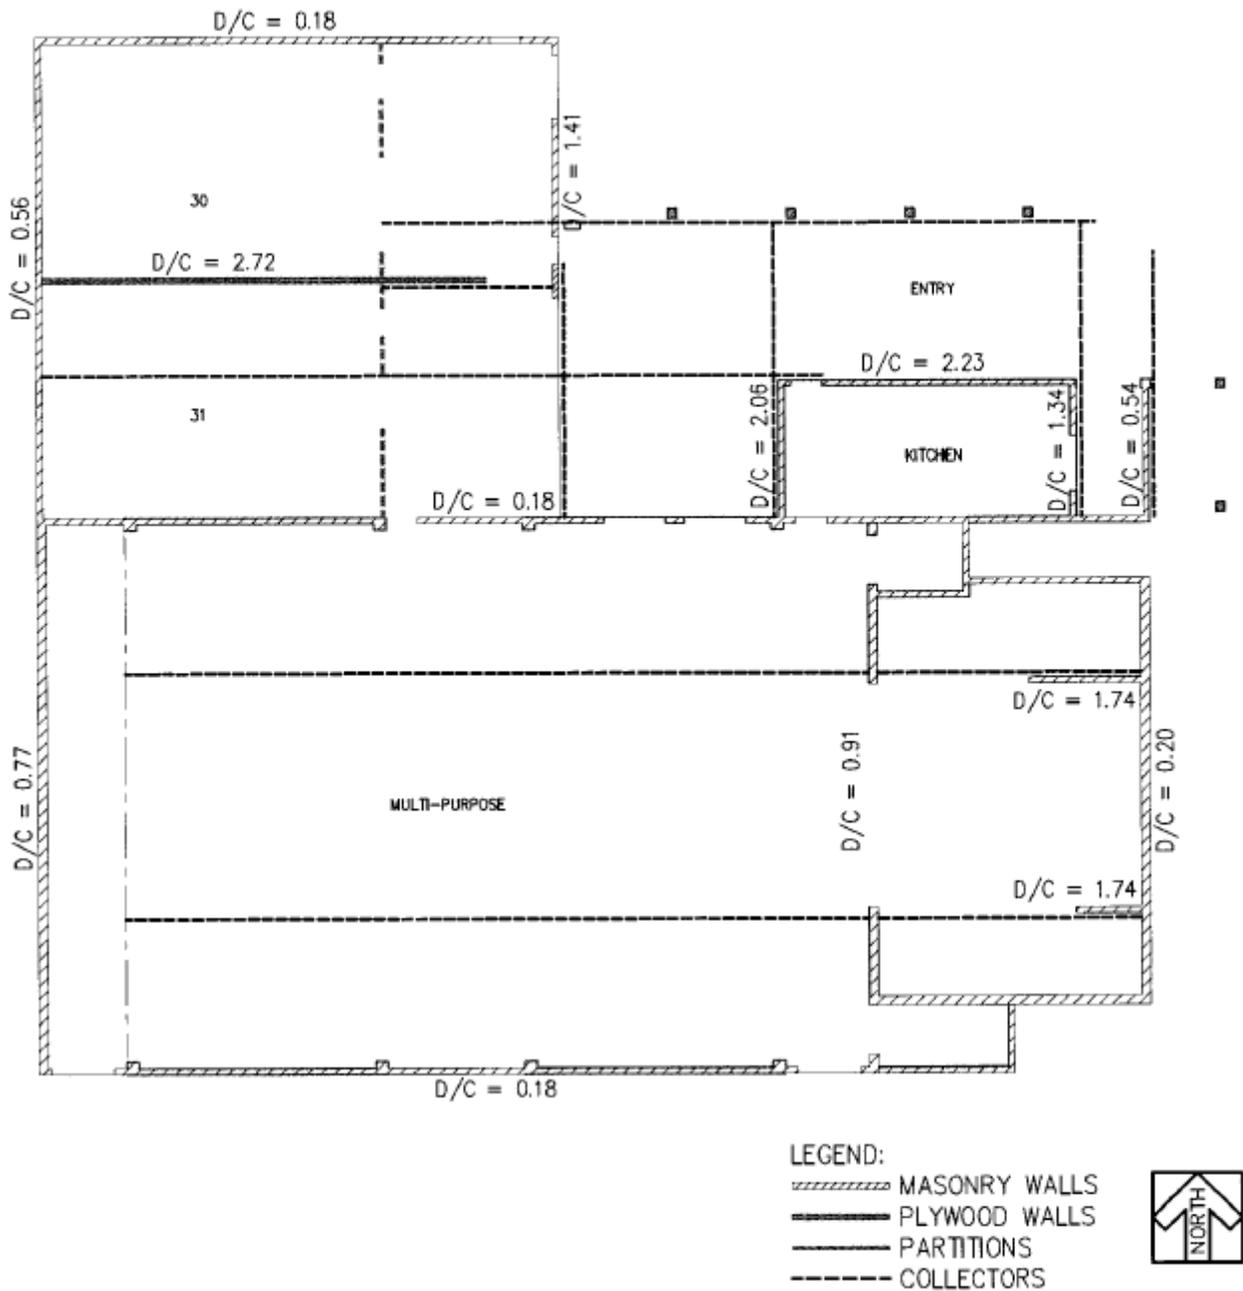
Building B demand-to-capacity ratios (D/C) for the connection of the roof to the shear walls.
